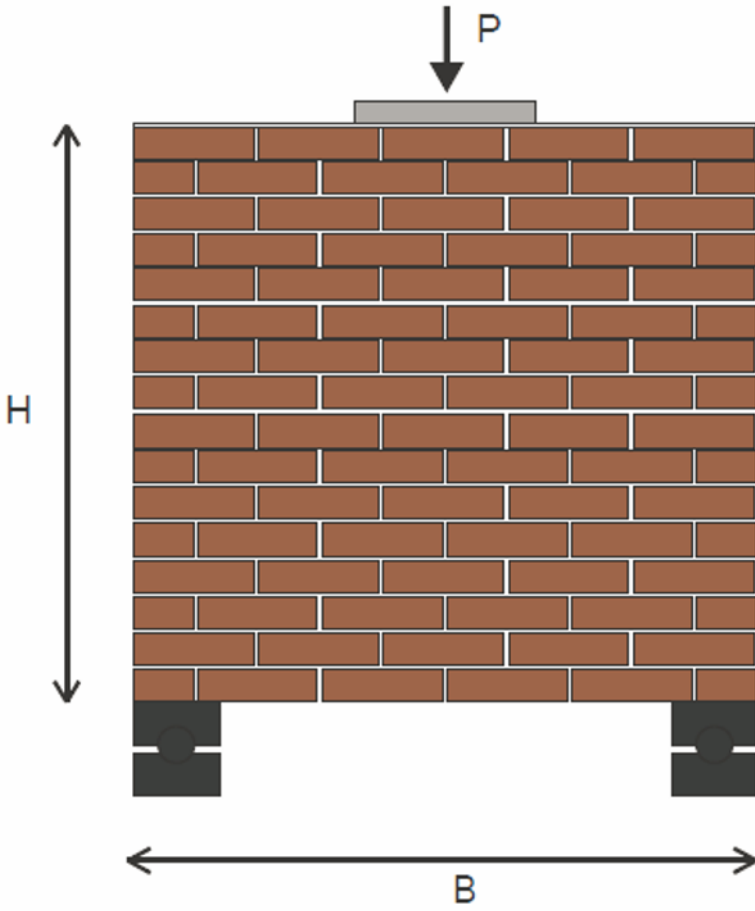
Masonry panel subjected to a vertical load: geometry and boundary conditions.
